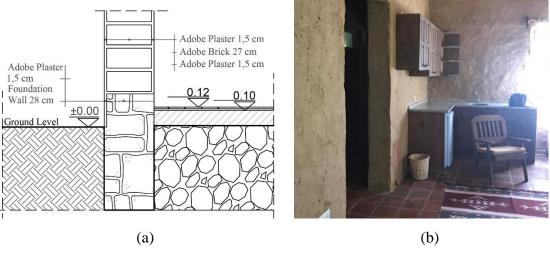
Section of exterior wall (a) and outer wall from inside (b) (Photography: Ekin G. Yöney, (2019), Location: Fethiye, Muğla)
